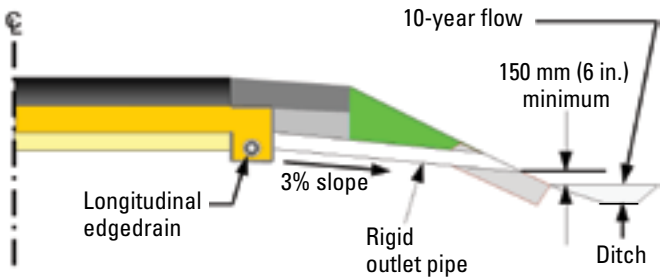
Outlet pipe configuration (FHWA 1992; NHI 1999)
